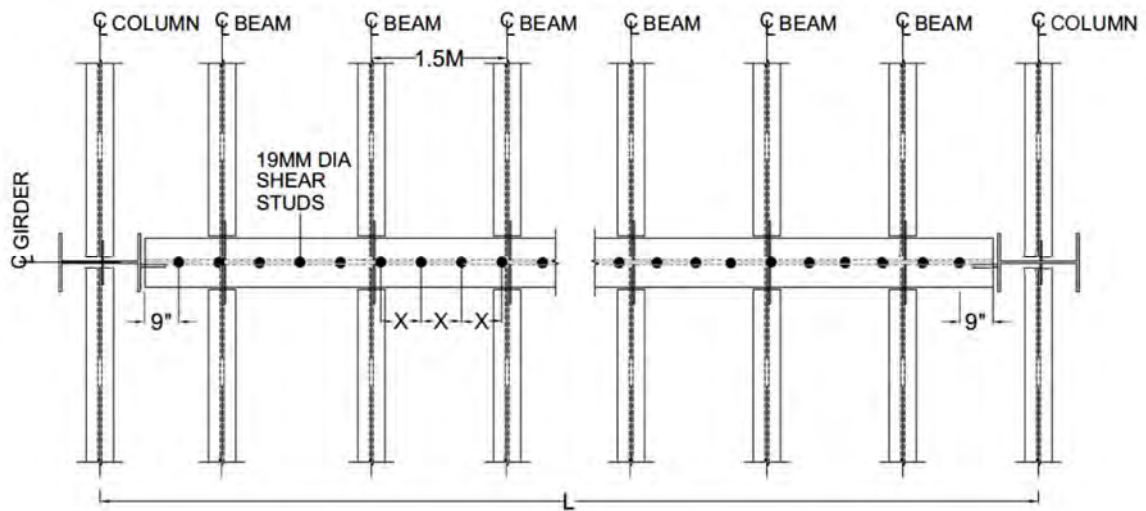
B Typical Layout of Shear Studs for Composite Beam (Single Stud)
